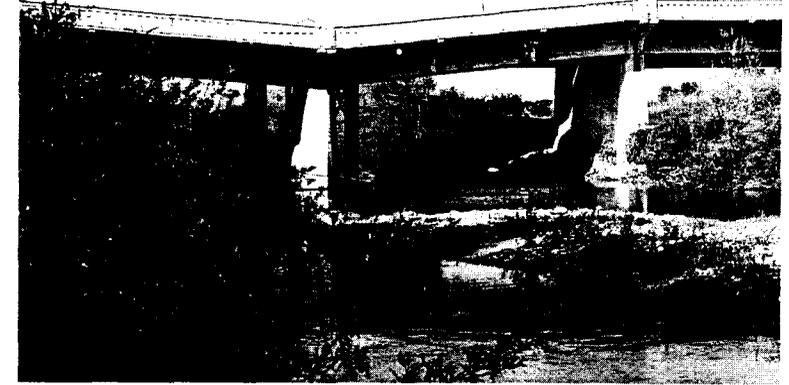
One of the mid-channel piers supporting this bridge sank about 1.5 m when it was undermined by scour in the river channel.
